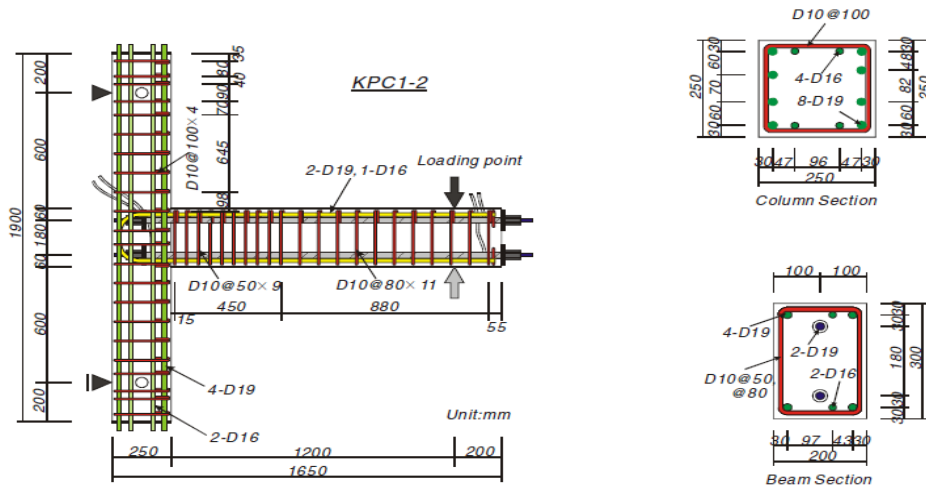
Reinforcement and prestressing detail of the test unit (Ref: *Wie Yue et. al., 2004*)
